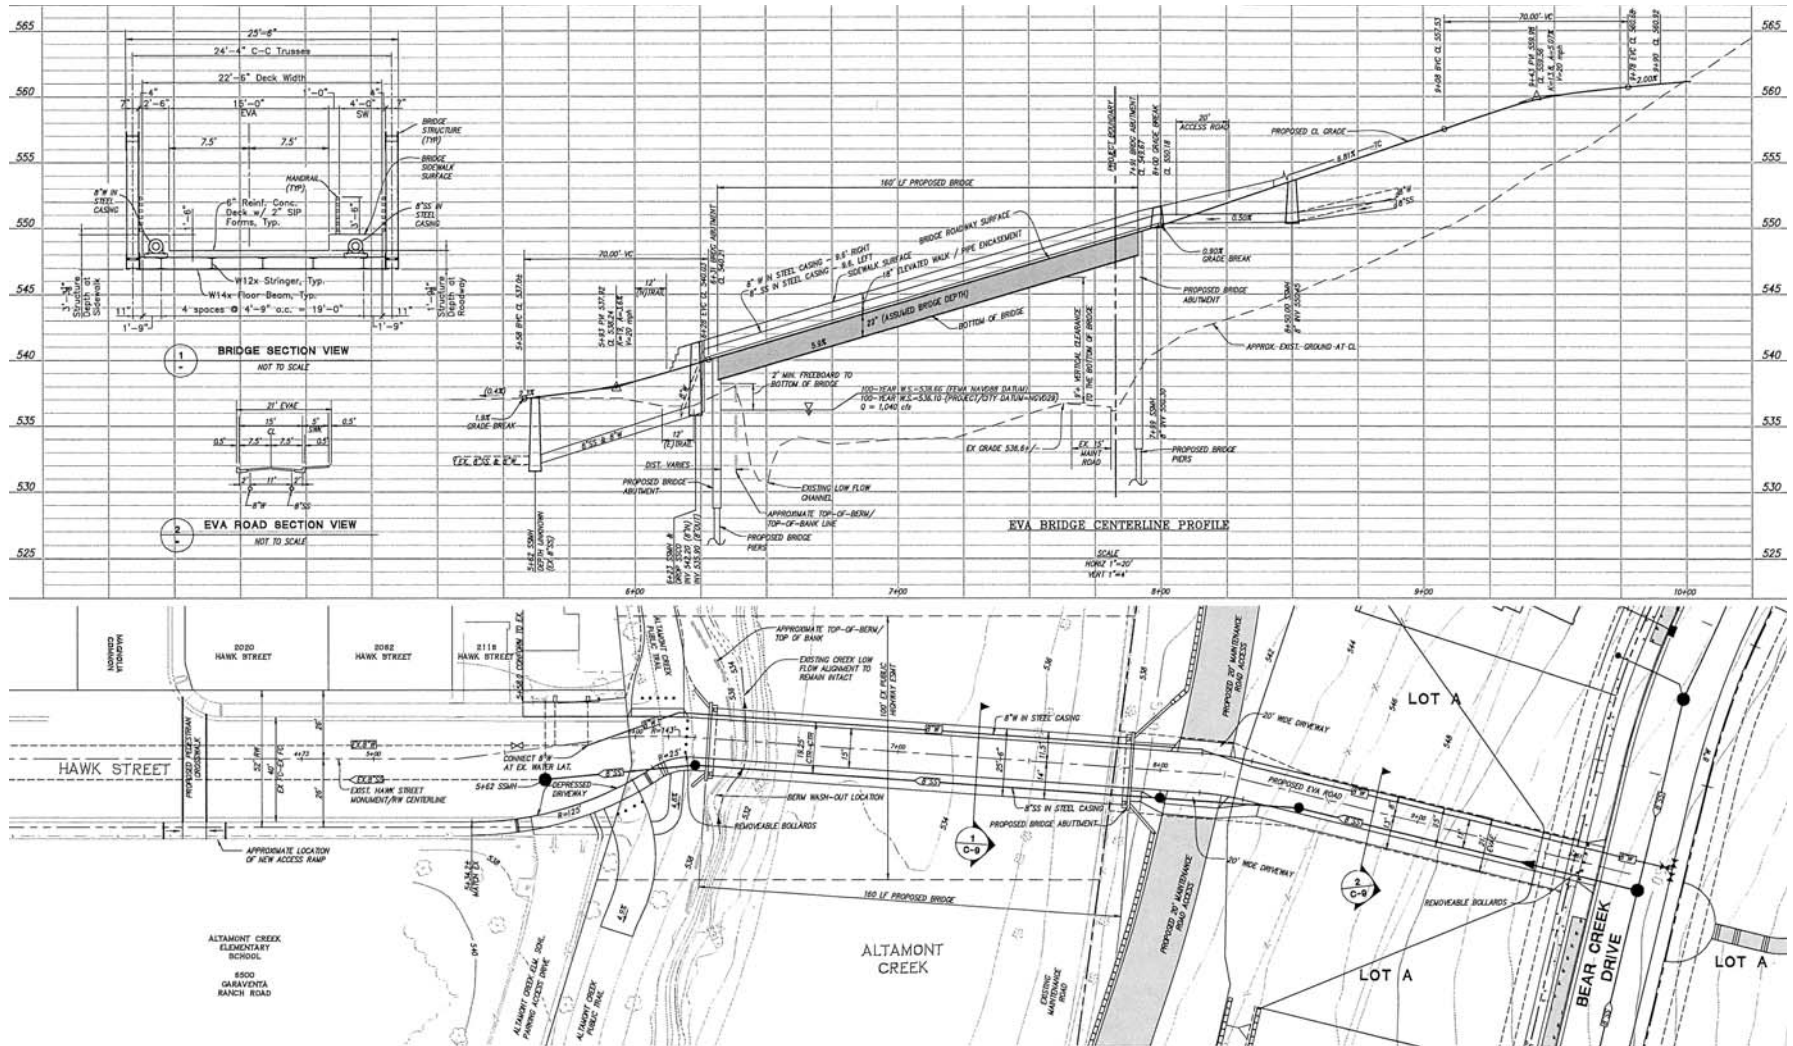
2018 Revised Project Pedestrian/EVA Bridge Plan
